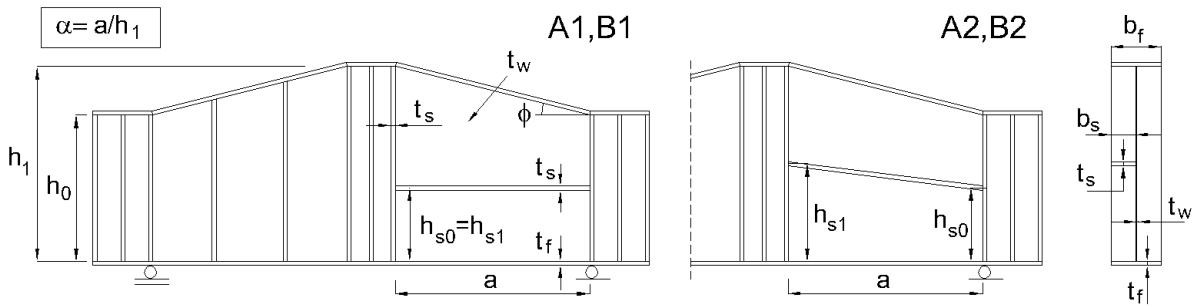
Geometry and notation of the tested specimens: a) girders A1, B1; b) girders A2, B2.
